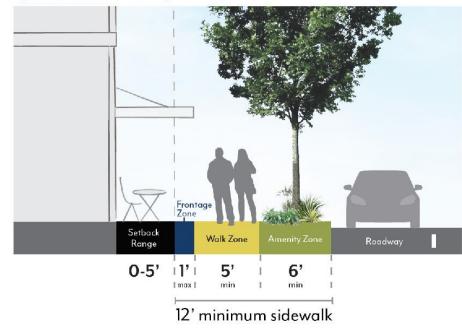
Sidewalks - Washington Commercial (WC)
